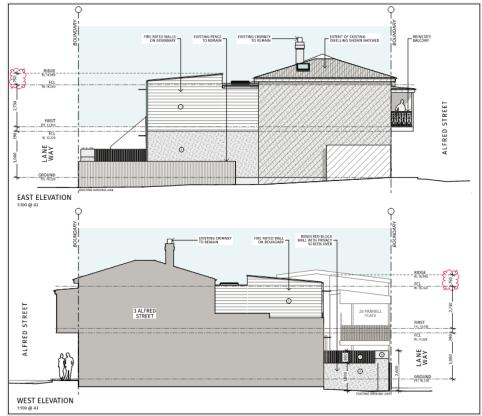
West & east (side) elevations depicting existing building footprint with proposed additions.
